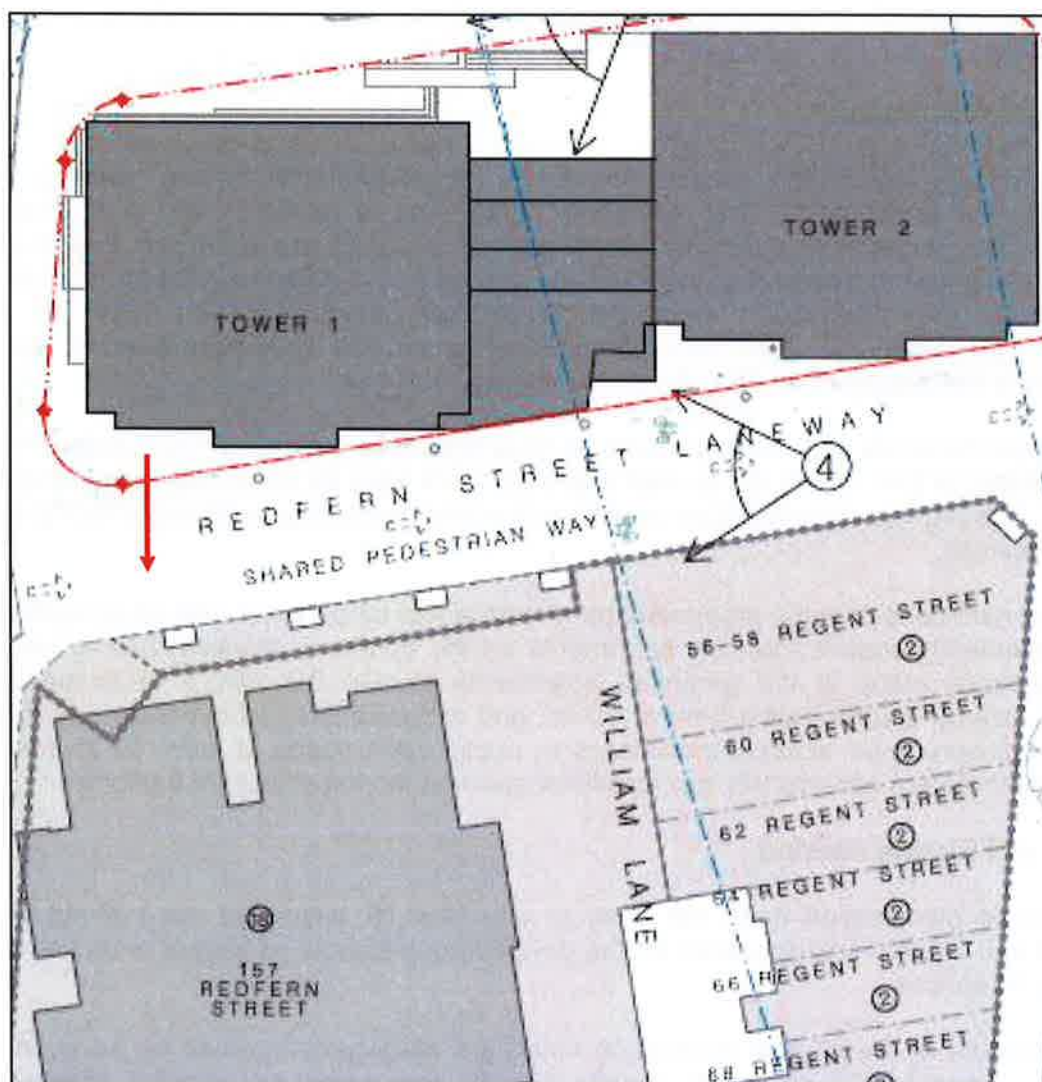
View lines between Tower 1 and 157 Redfern Street (Source: EIS for MOD 3)
